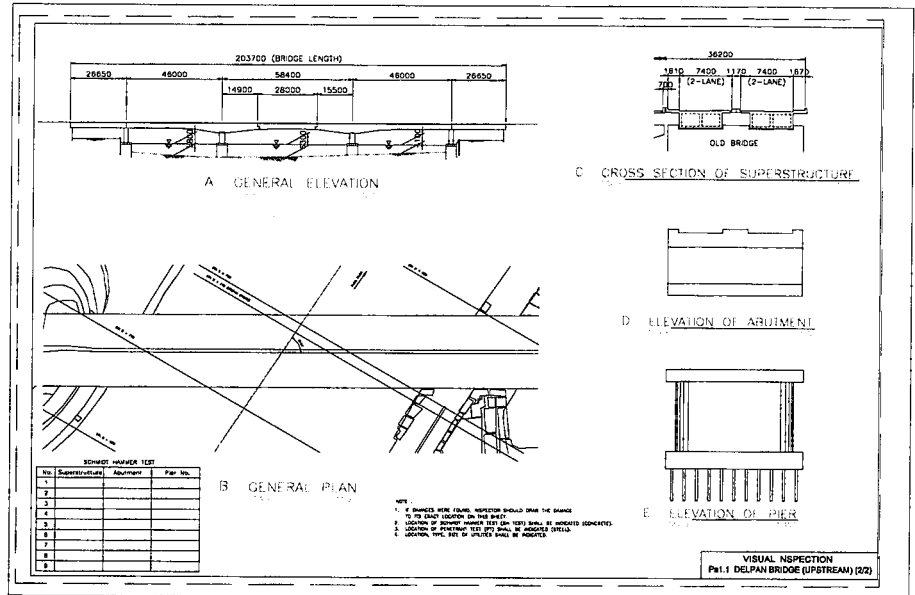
Visual Inspection Sheet 2 of 3
